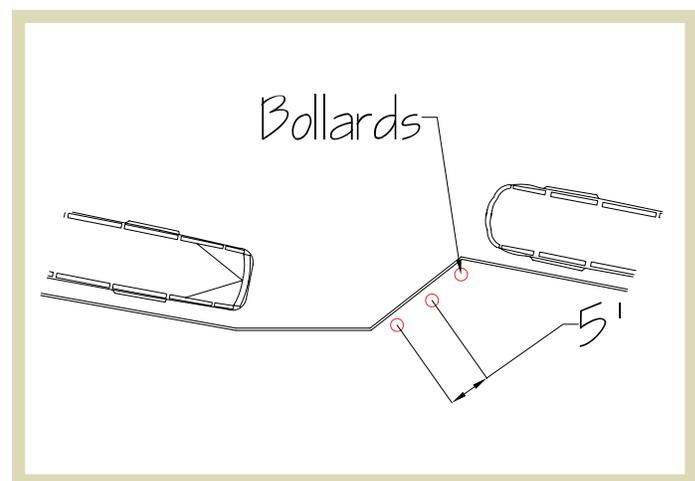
| Plan showing bollards in an off-street half saw-tooth bus bay.
